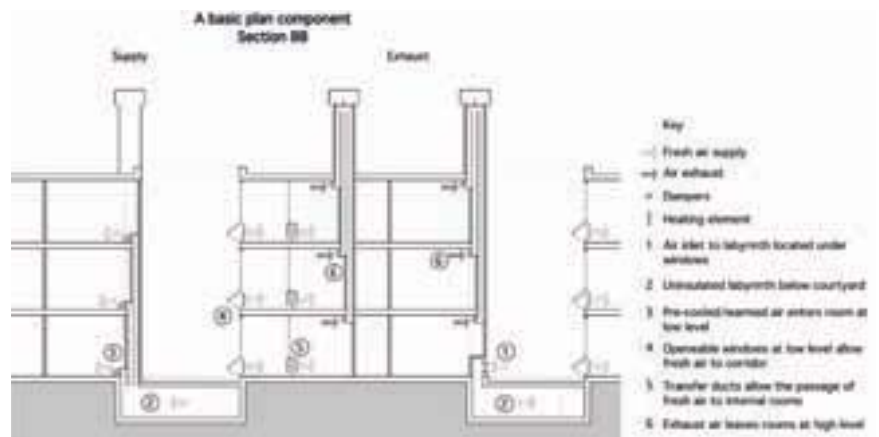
In the proposed new plan, supply air passes through a concrete labyrinth below the courtyard, feeding supply ducts within a double facade
